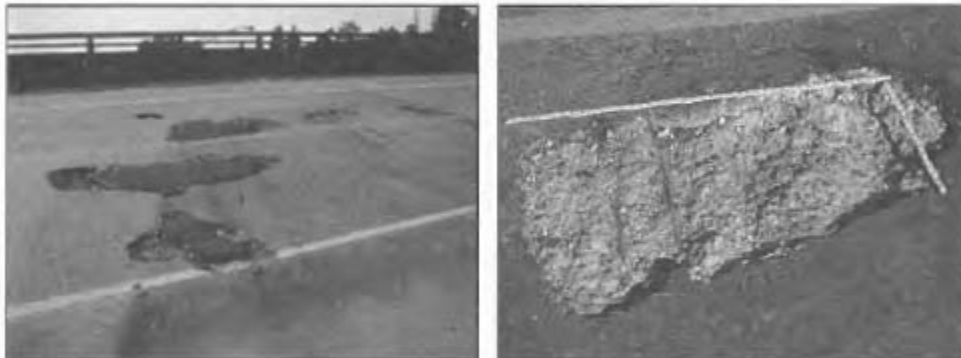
Spalls and Distressed Patches in Span 4 Deck
